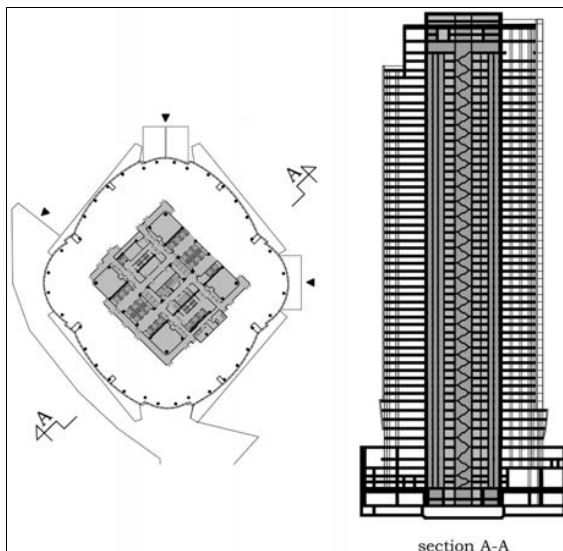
Roppongi Hills Mori Tower: floor plan and section
